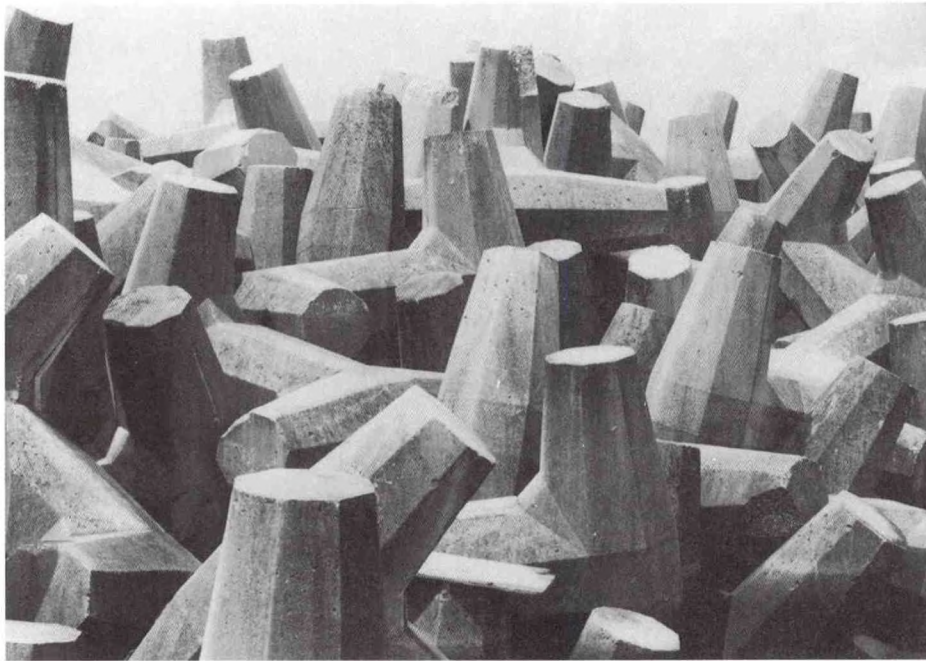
An extensive breakwater at the Bridgetown fishing port has been constructed by these concrete rip-rap, providing a secure harbor from all but the most violent hurricanes. Dennis Weidner
